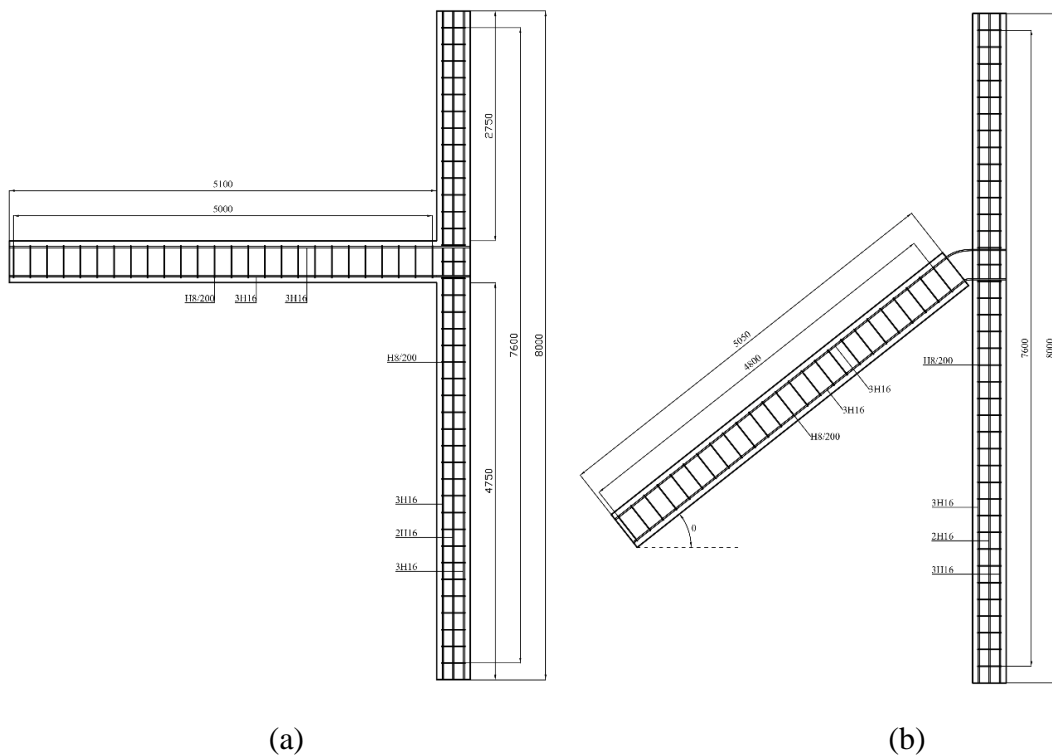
Geometry and reinforcement details of: (a) an undamaged and (b) a damaged beam-to-column junction (units: millimetre).
